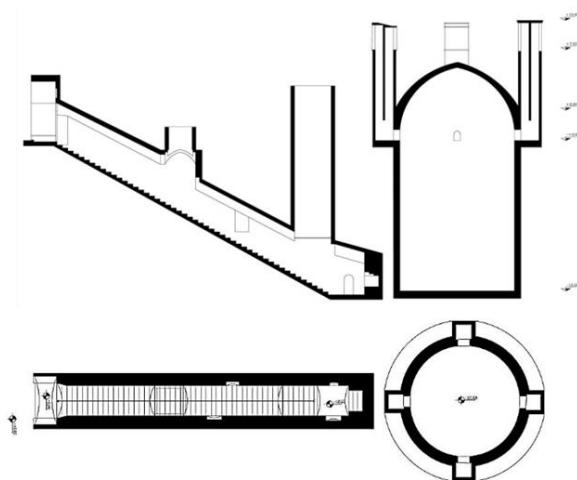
, plan and section for Youzdaran cistern, Yazd, source (YCHHTO 2013)
